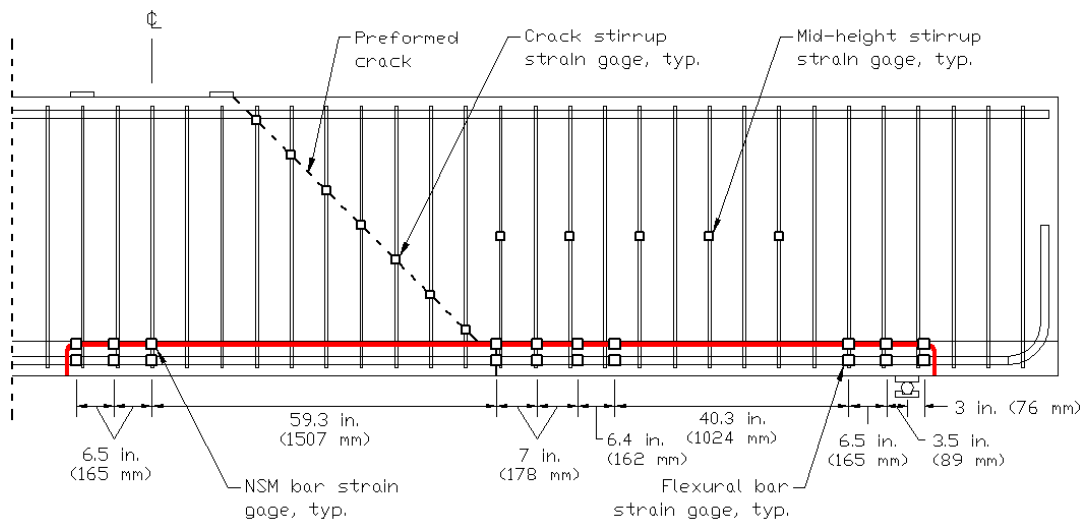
Typical internal sensor array for IT specimens (6 in. stirrup spacing).
